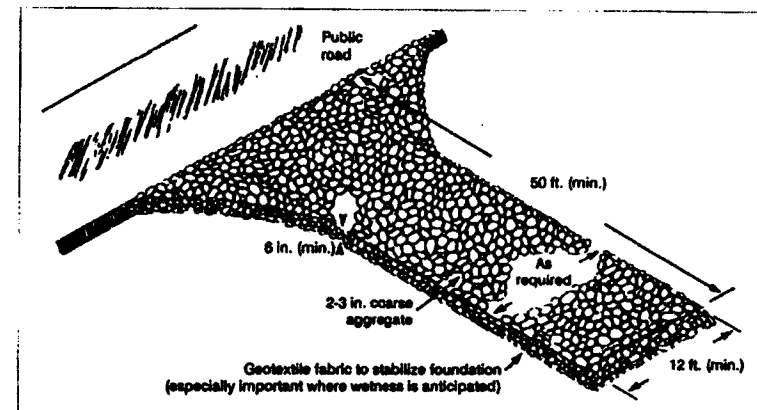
B. Plan of a temporary gravel construction entrance/exit pad.
